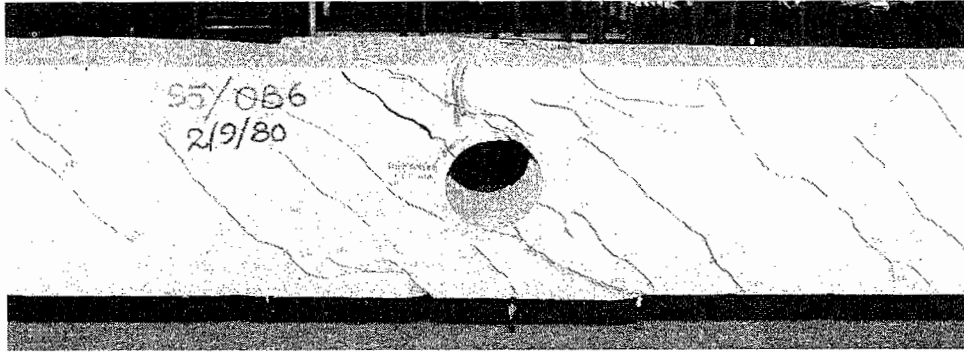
Failure surface of a plain concrete beam with circular opening.
